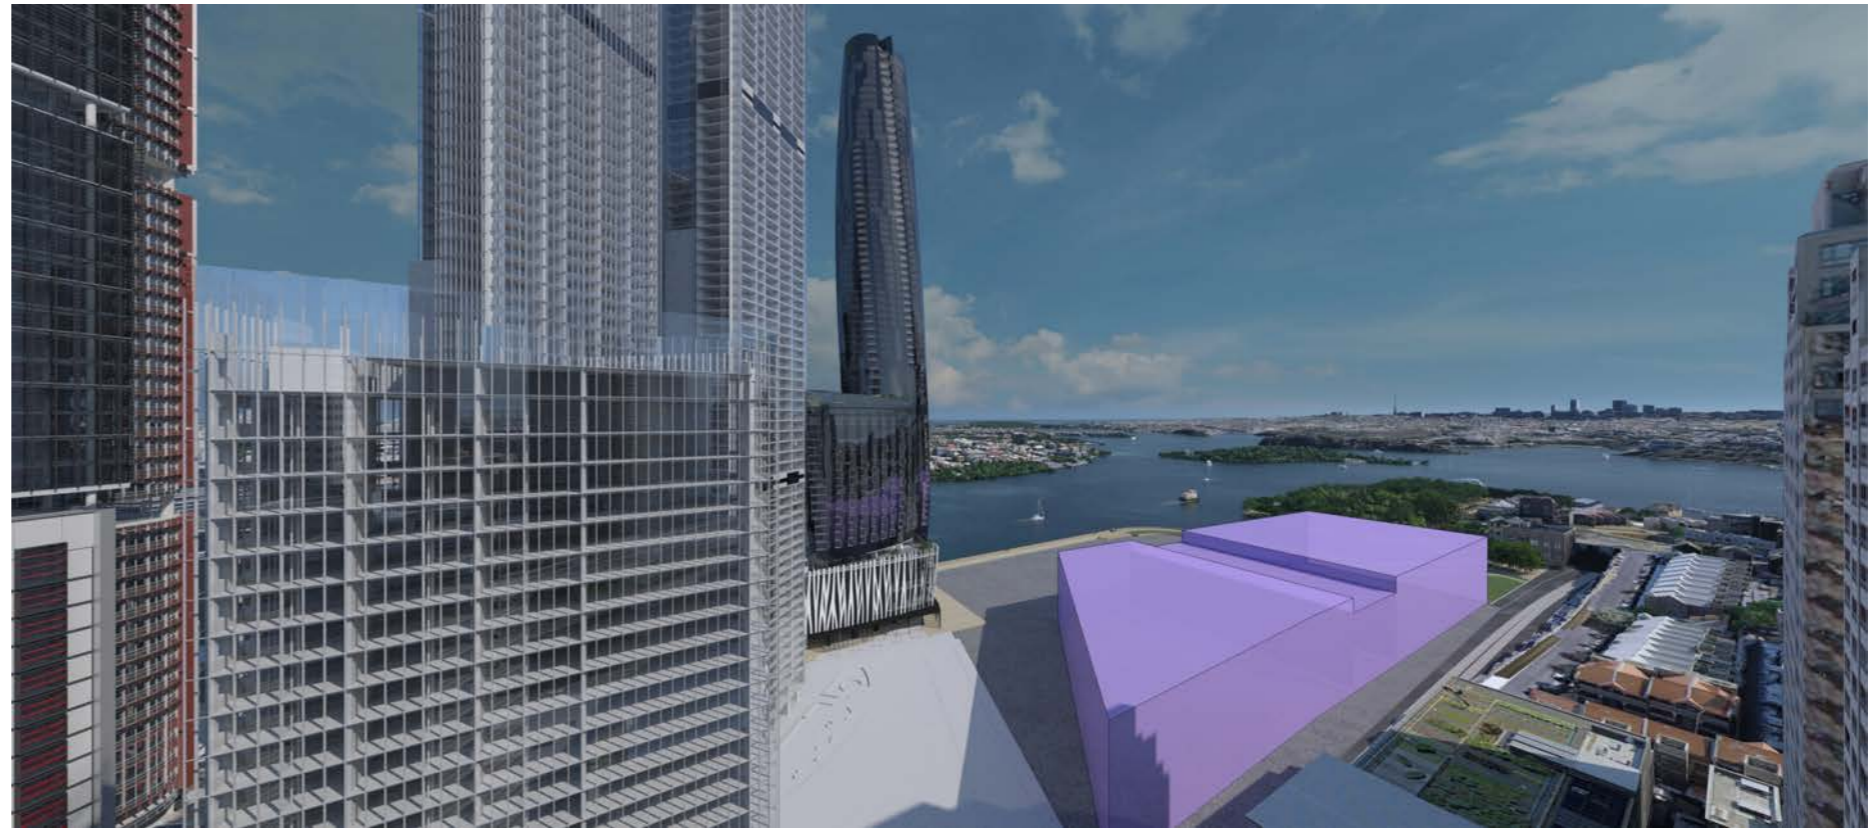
Before view with the Approved Concept Plan (Source: Arterra Interactive, March 2021)
